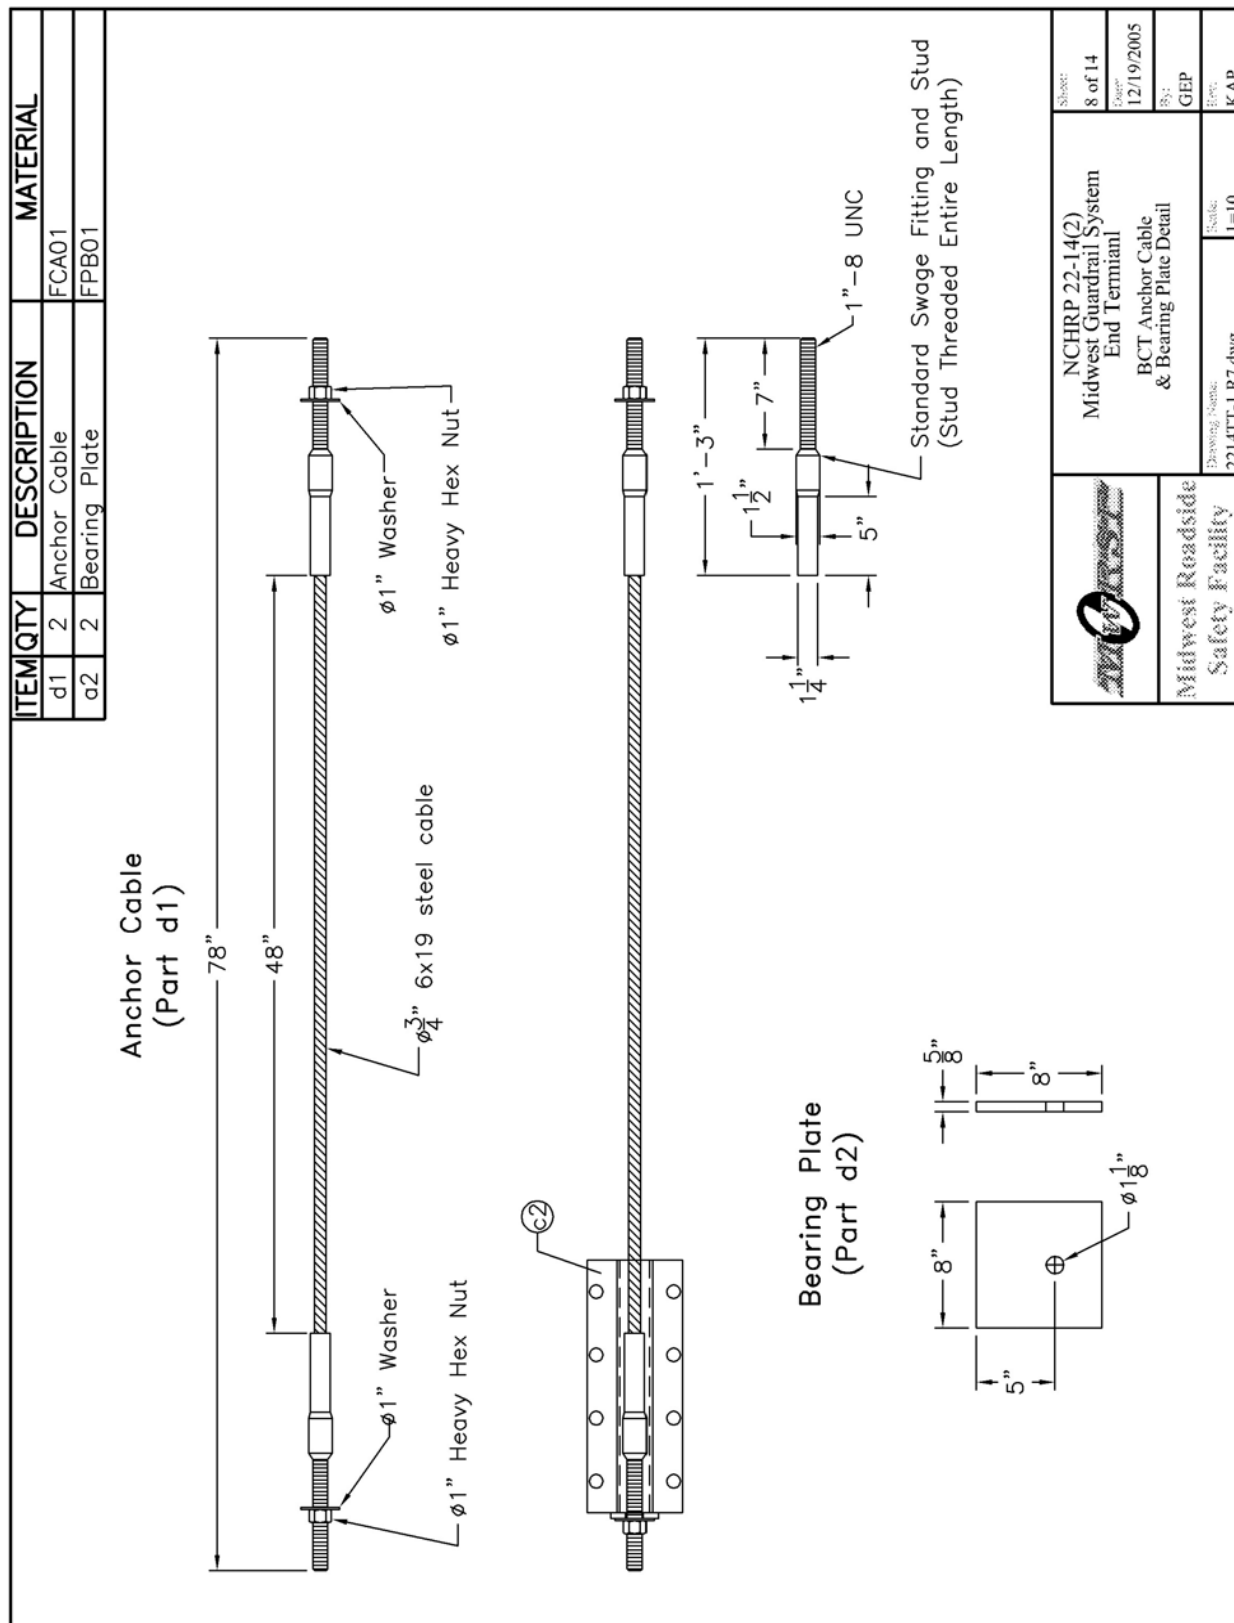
Midwest Guardrail System End Terminal - Anchorage Details (English)
